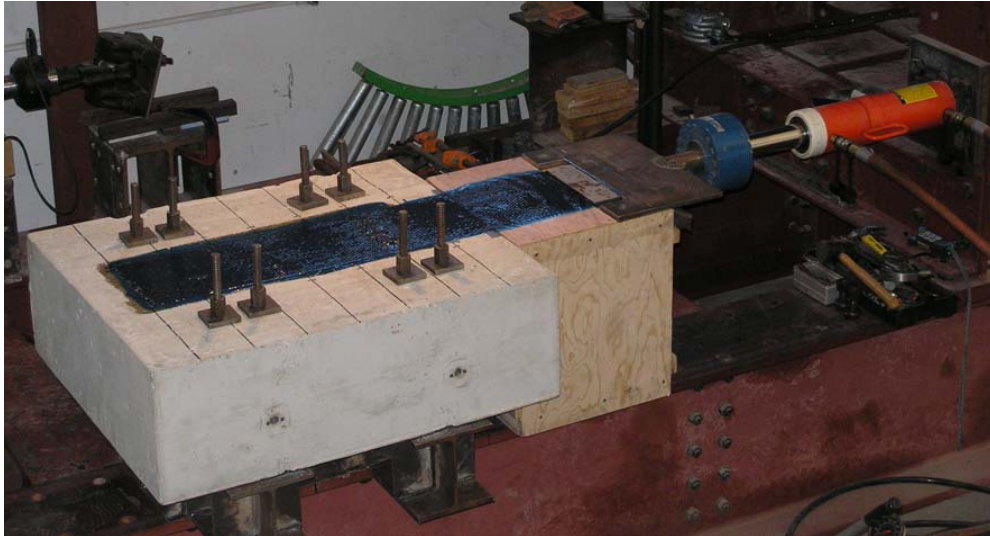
Shear test for CFRP anchors [Niemitz, 2008]
